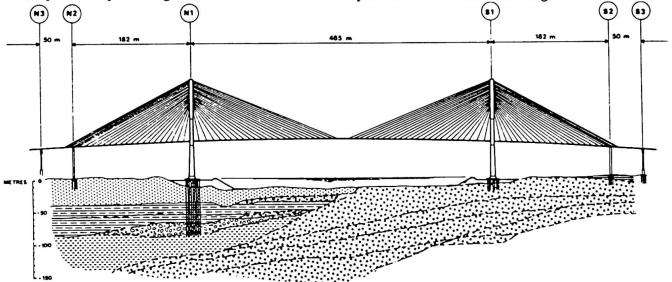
SITE GEOLOGY AND BRIDGE ELEVATION
